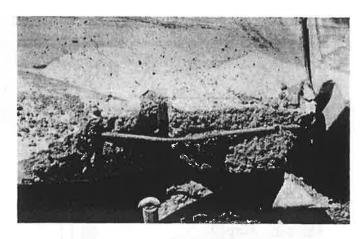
Lack of anchor reinforcement led to a concrete failure Source: TTI Report 405160-3-1 (41), p40.
